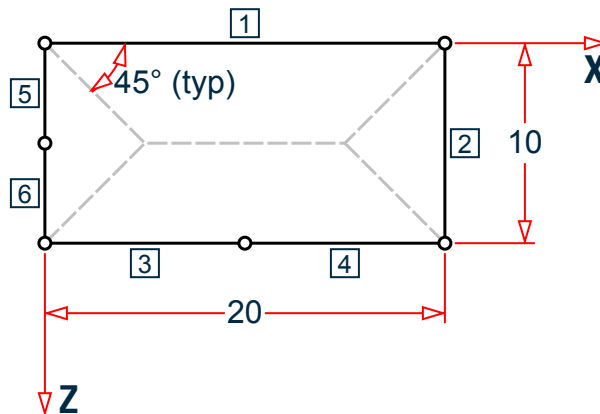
Members 1 and 2 get full trapezoidal and triangular loads respectively. Members 3 and 4 get partial trapezoidal loads and 5 and 6 get partial triangular load.
